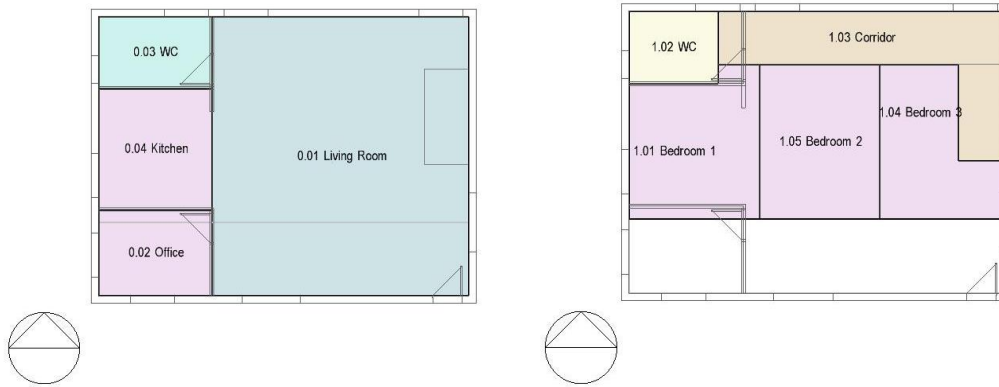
Geometrical layout and type of use of the rooms. Ground Floor on the left and First Floor on the right.
